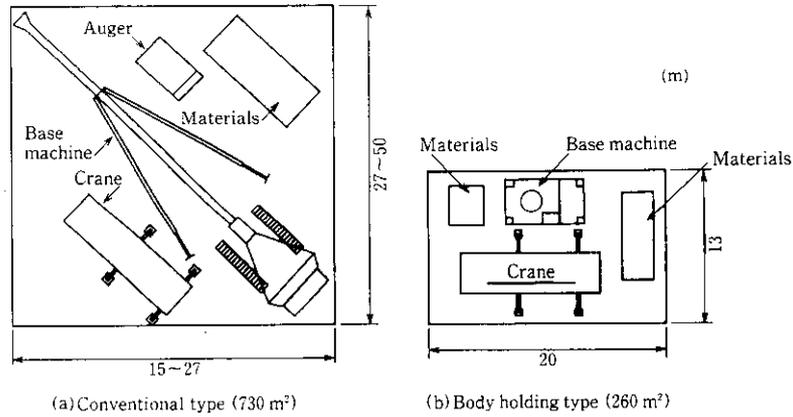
Field necessary for assembling and dismembering of pile driving machine
